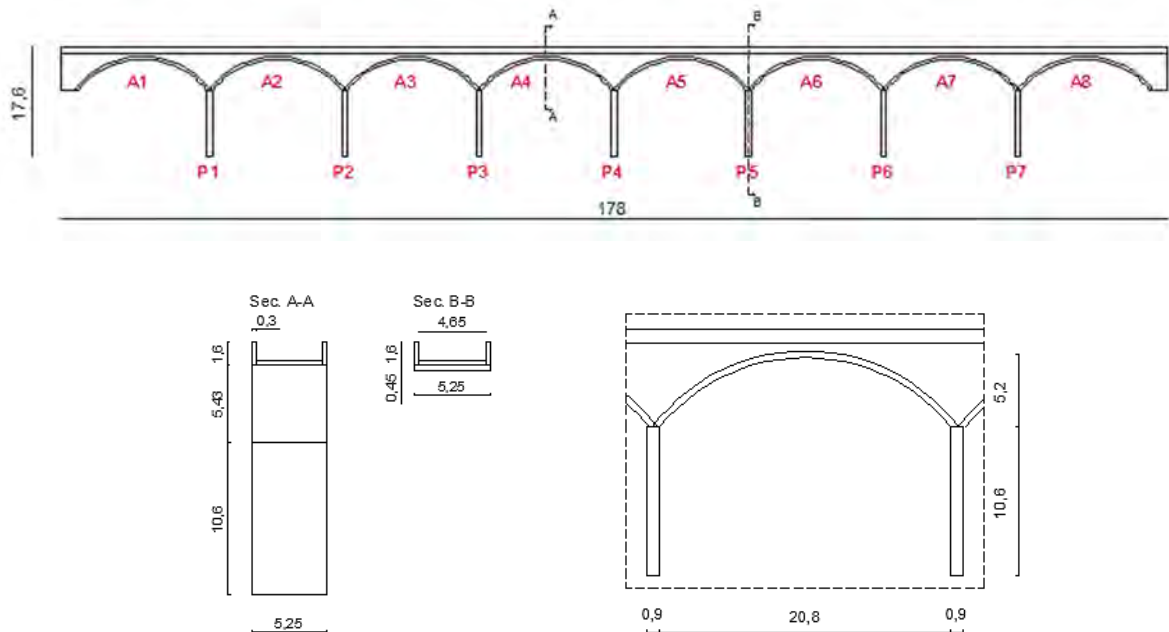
New concrete bridge structure, sections and particular arch-pier
